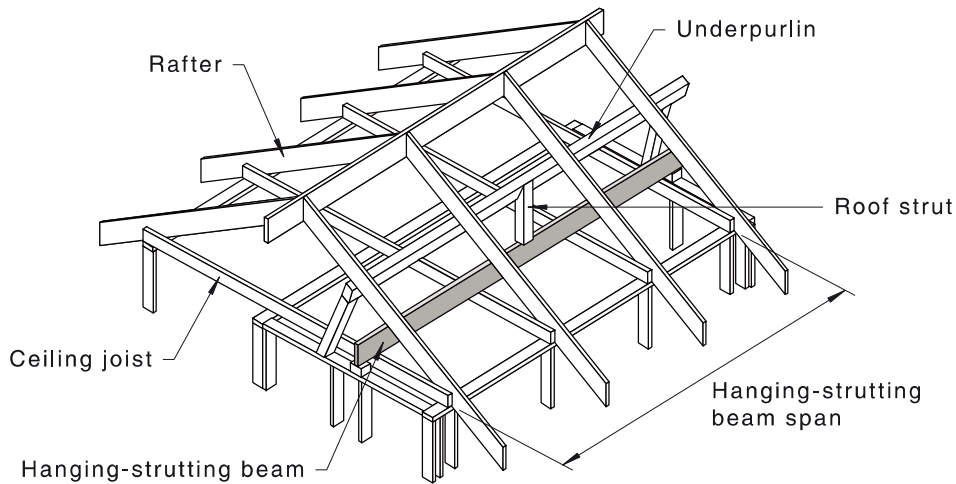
COMBINED HANGING-STRUTTING BEAM
